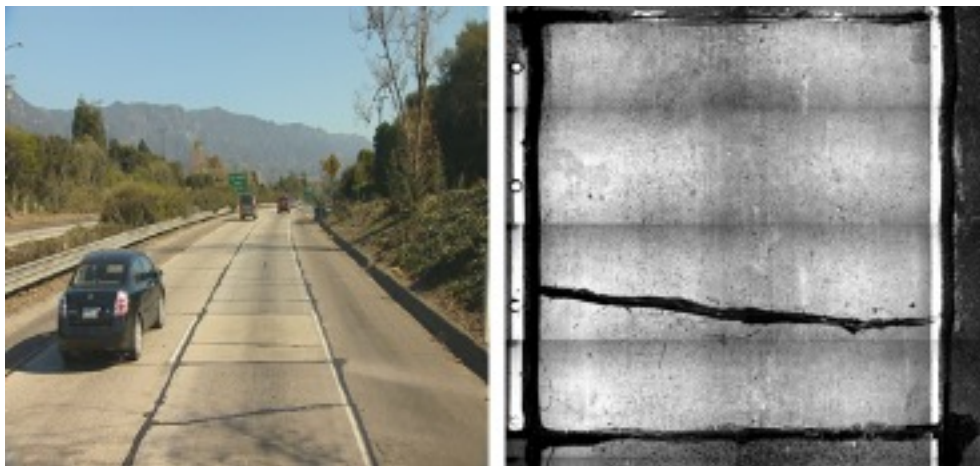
Right of Way (ROW) and downwards images of a replaced slab, with a single transverse crack that has been sealed.
